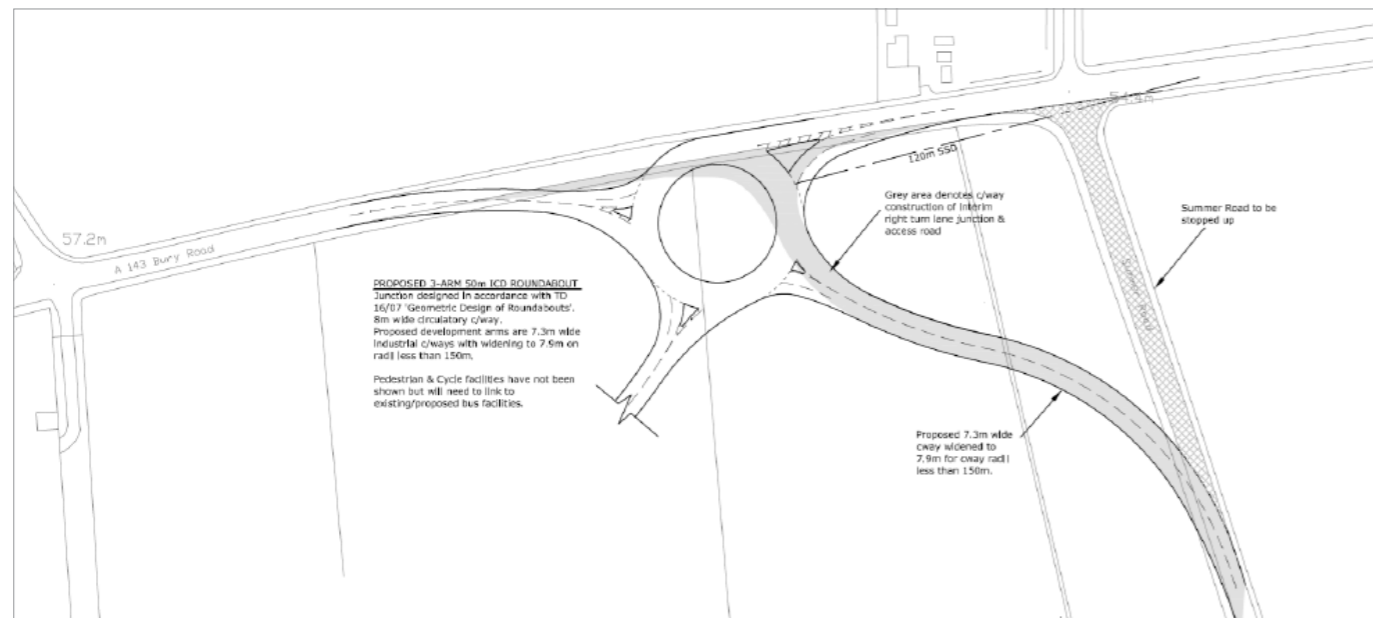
Layout of Proposed New Access Roundabout on A143 (as approved under Application Ref. SE/02/1747/P)
